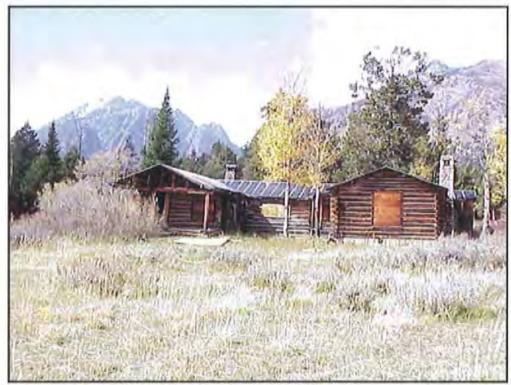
Front (east) wall of HS-1156, Hammond Cabin. The open porch visible at the south end of the building is part of the original building. Everything north of the porch is an addition. Source: A&E Architects, 2004.
